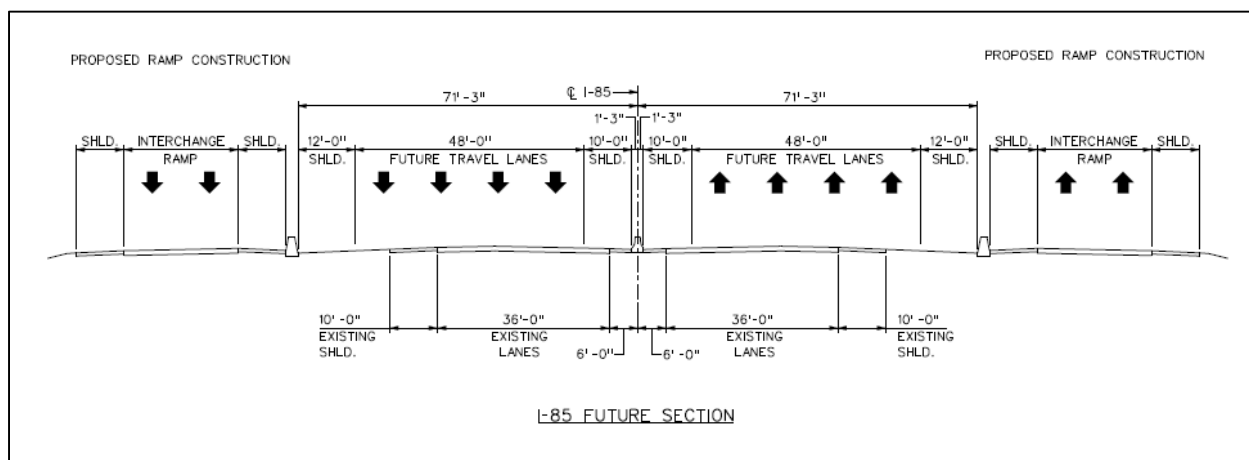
I-85 Future Typical Section (I-85 shown, I-385 similar)
